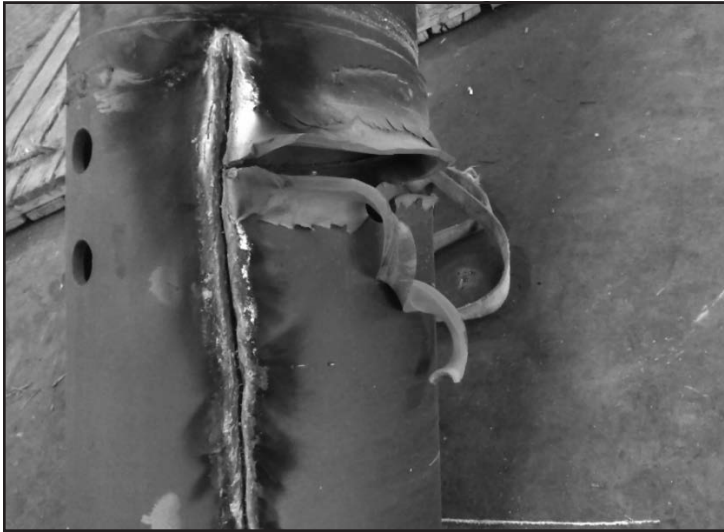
Pile damaged during installation. Bolts at splicing sleeve connection sheared the pile wall
